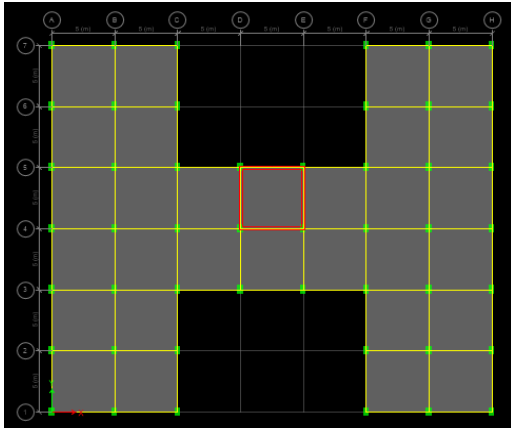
Plan view shear wall building without staggered openings Fig 2 3D view shear wall building without staggered openings
